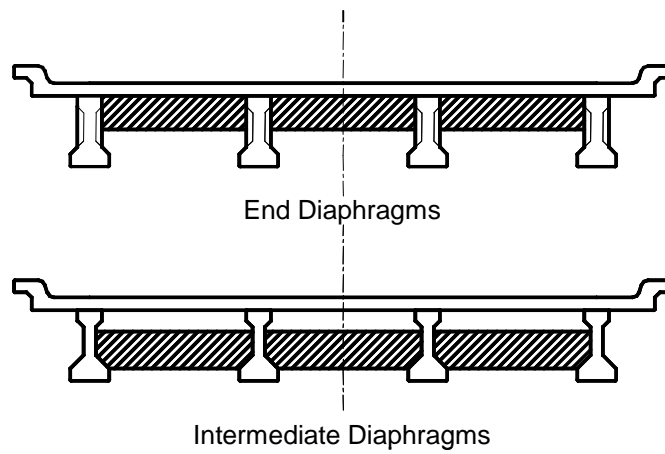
Diaphragm Details for Lake LBJ Bridge (Wagner 2002)
